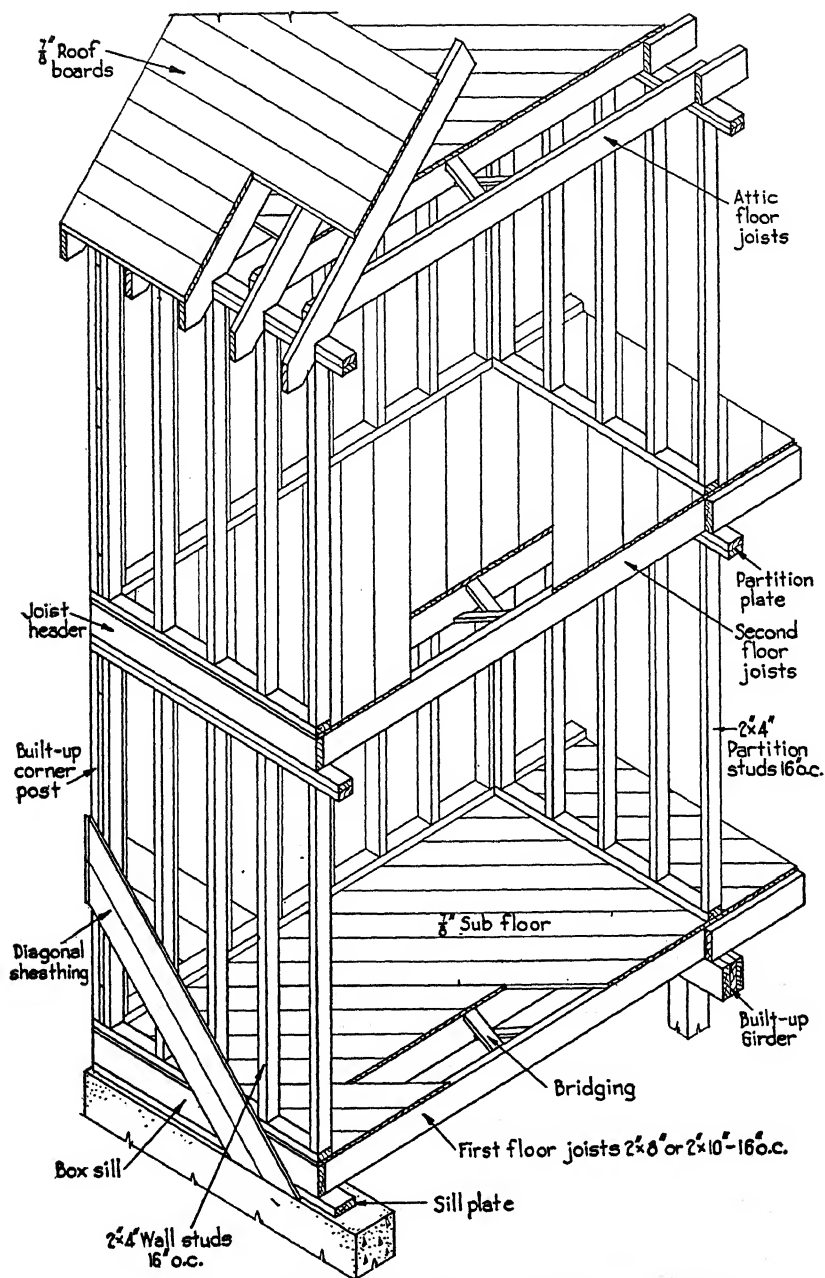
DETAILS, AMERICAN PLATFORM FRAME CONSTRUCTION
